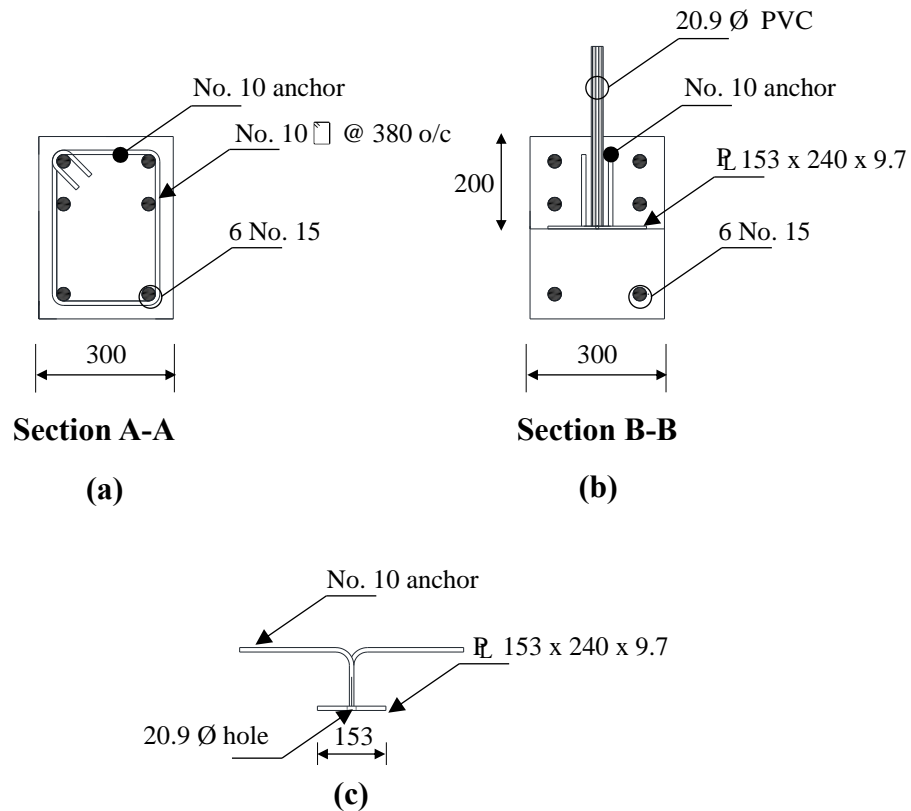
Concrete grade beam sections: (a) section A-A, (b) section B-B, and (c) steel plate details (dimensions in mm).
